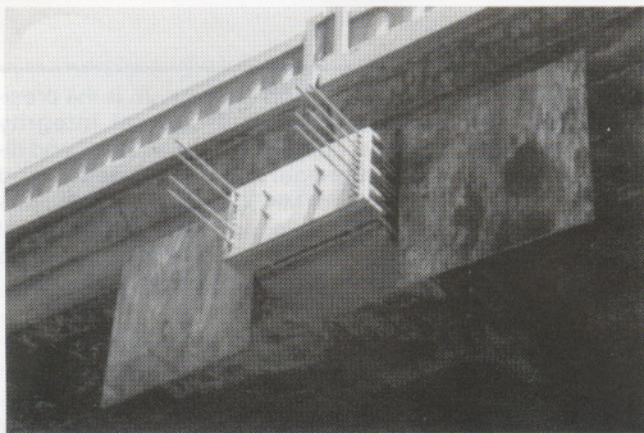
Reaction plates in place and CFRP rods being positioned.
